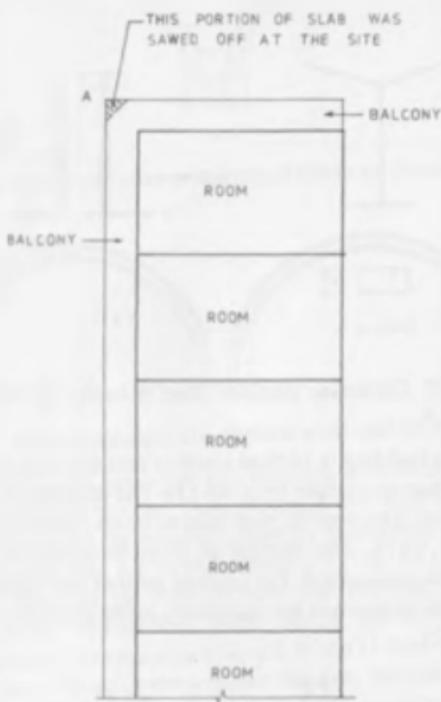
9. Sagging of a diagonal corner of a balcony slab.
